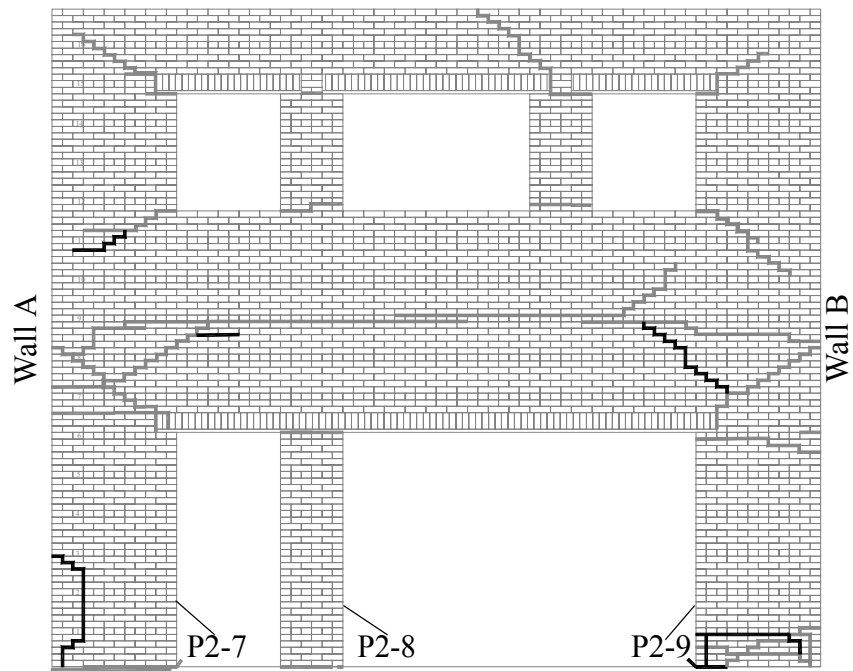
Crack pattern in Wall 2 following Test Run 41.
